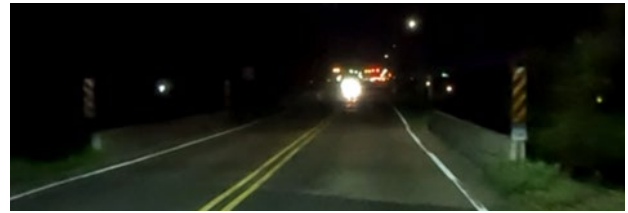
Reflectors do not exist along the bridge walls of Stone Dam Creek Bridge.
